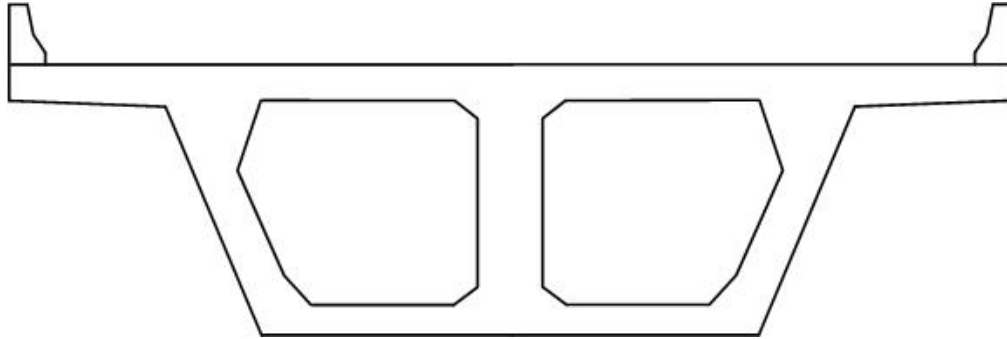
Cross Section - Multi-cell Box Girder
